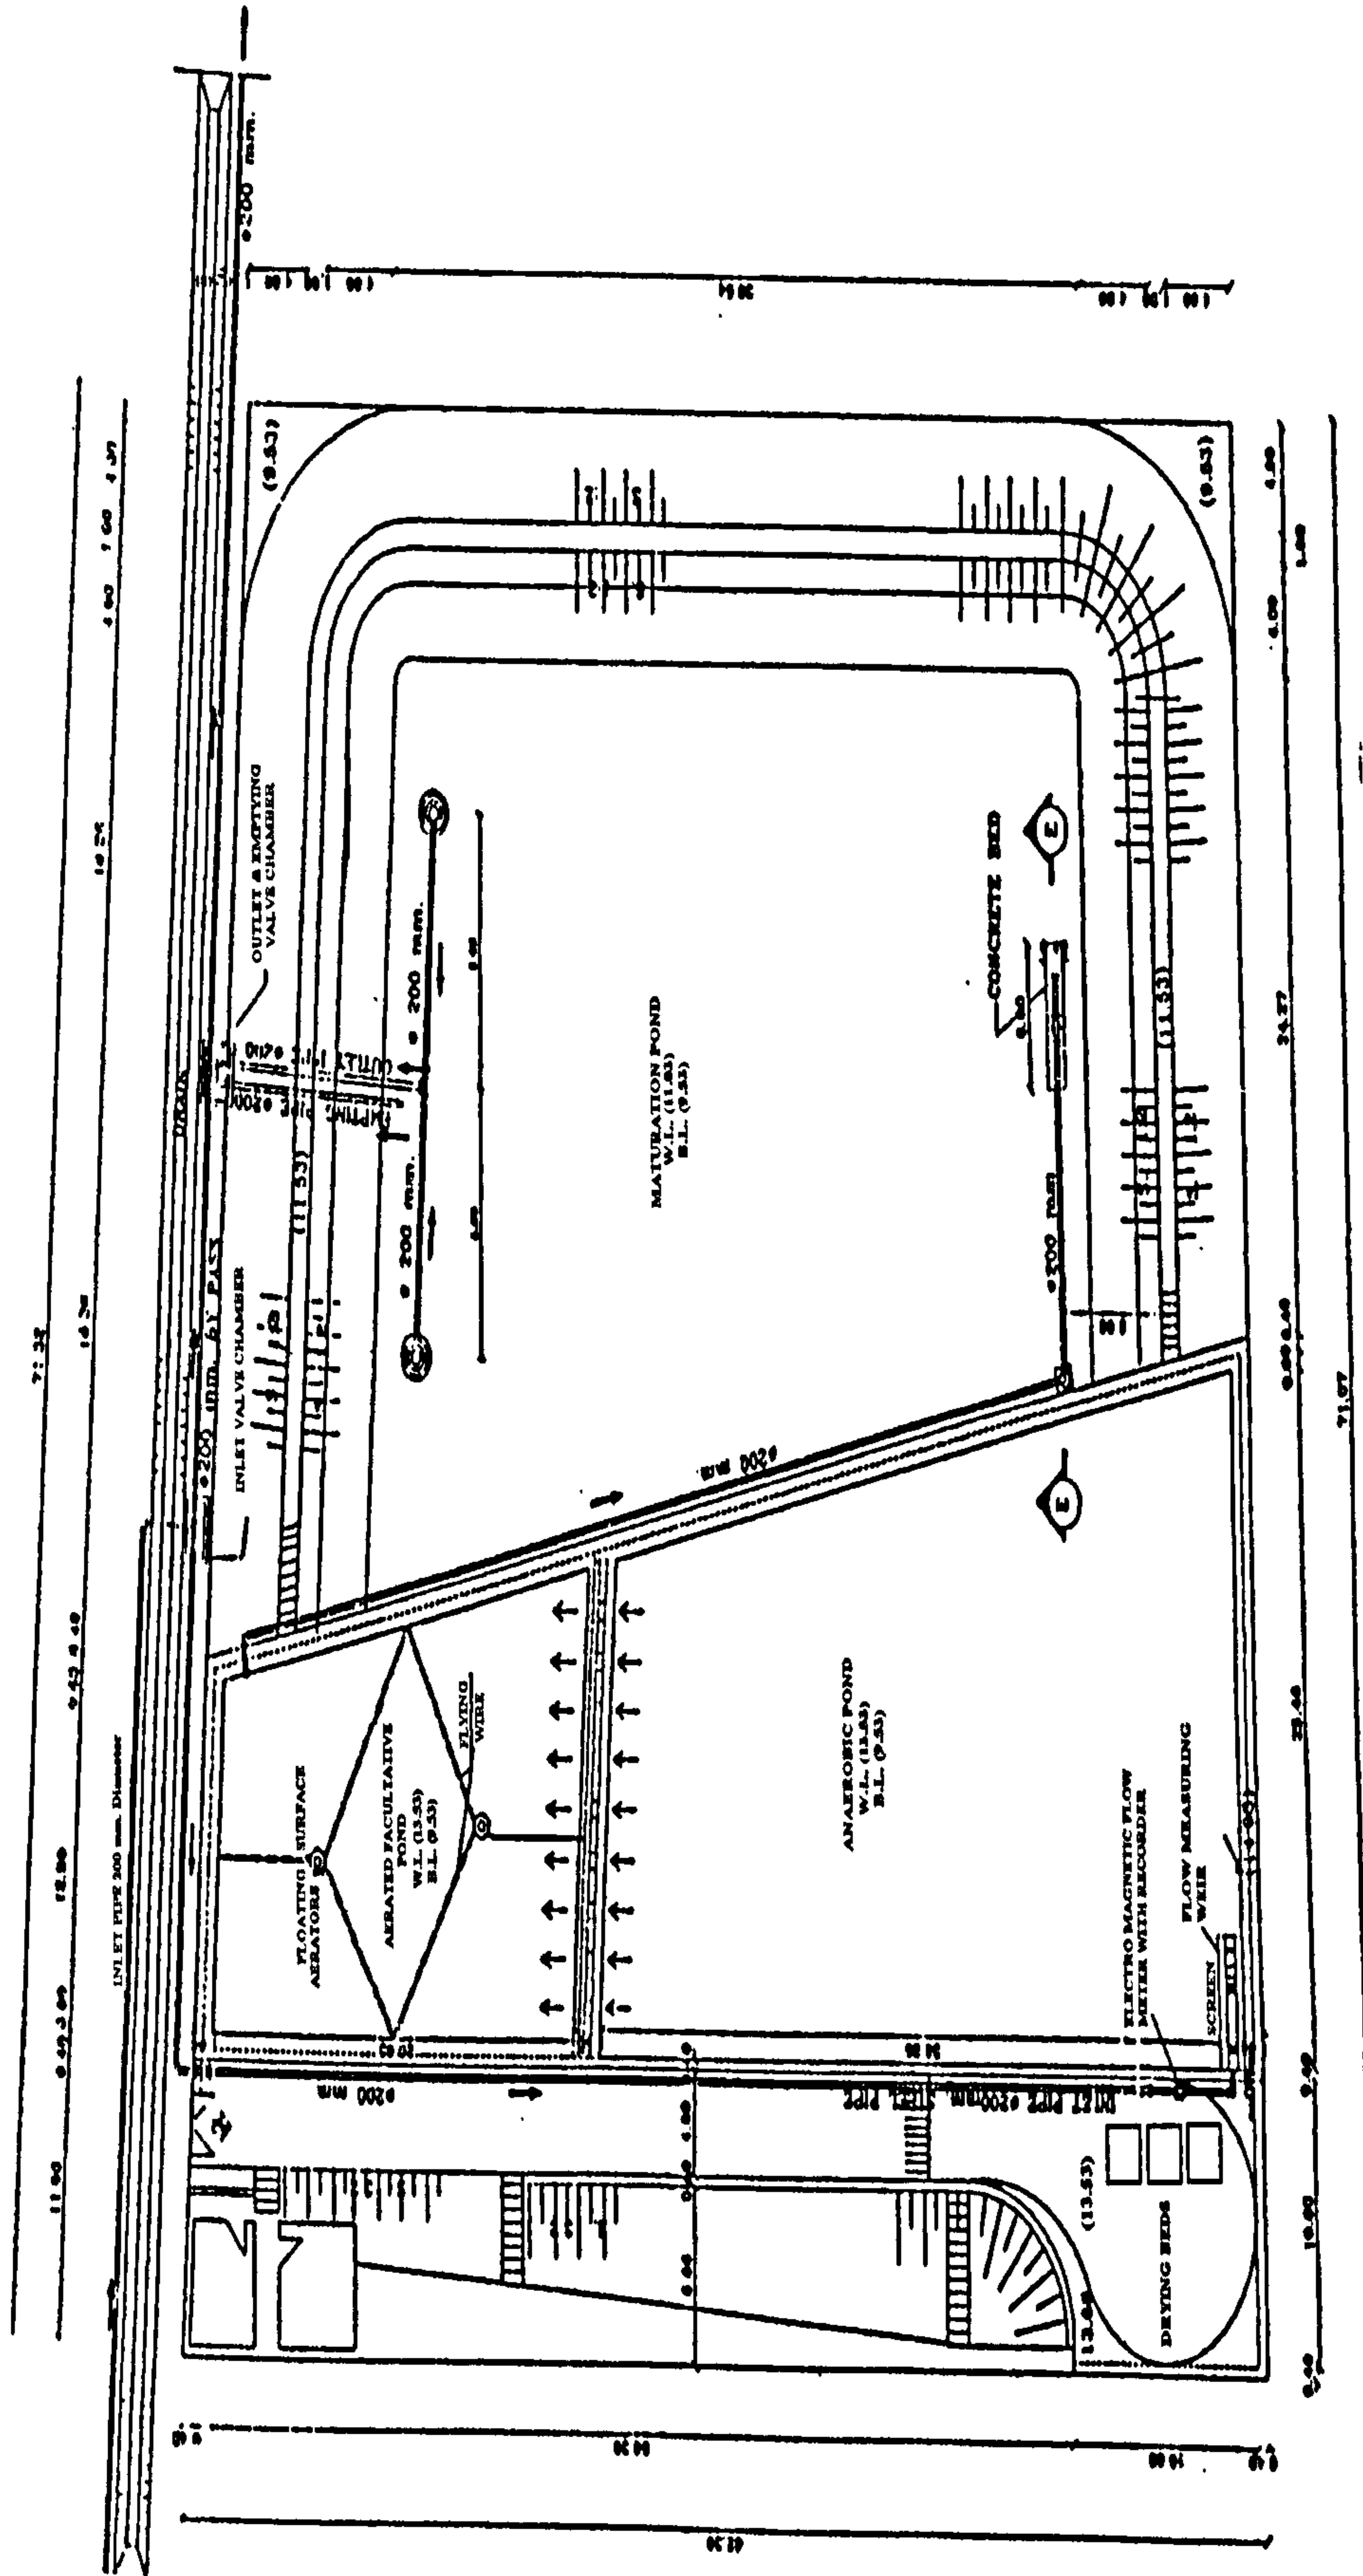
General Layout of Mit Mazah Waste Stabilisation Pond
